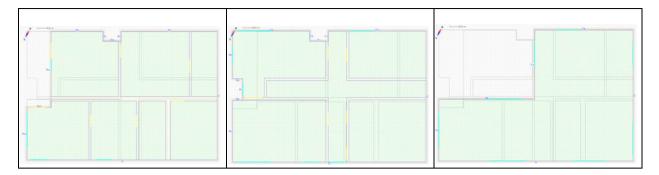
Plans of the building with ground floor (left), first floor (centre) and second floor (right).
